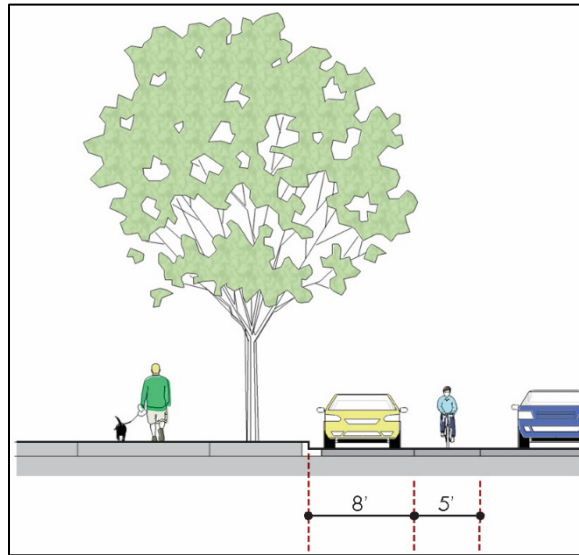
Minimum Conventional Bike Lane Width with On-Street Parking, Commercial and Mixed-Use Streets. When a conventional bike lane is located between an on-street parallel parking lane and a vehicle travel lane, the minimum allowable configuration is a 5 ft wide bike lane next to a 8 ft wide parking lane for a minimum total reach of 13 ft on streets with commercial and mixed uses.
